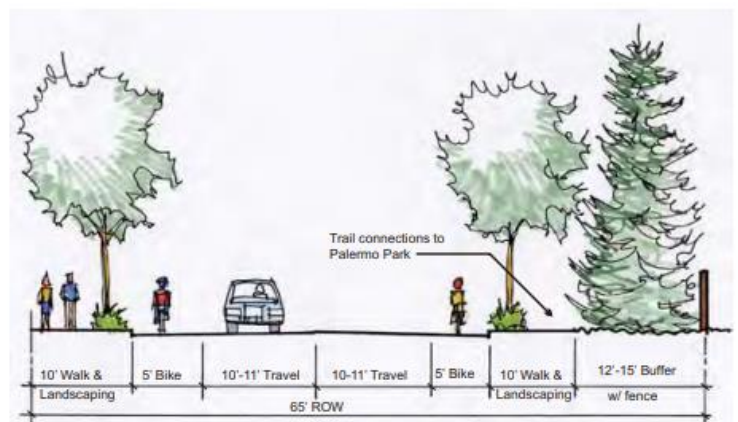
The proposed new North-South Access Street conceptual plan and section
